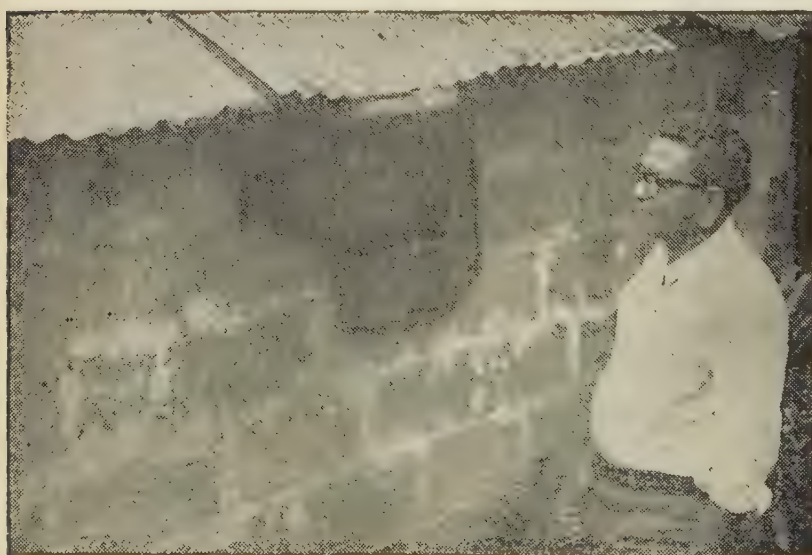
A cow-byre made of brick wall and with a corrugated iron roof.
